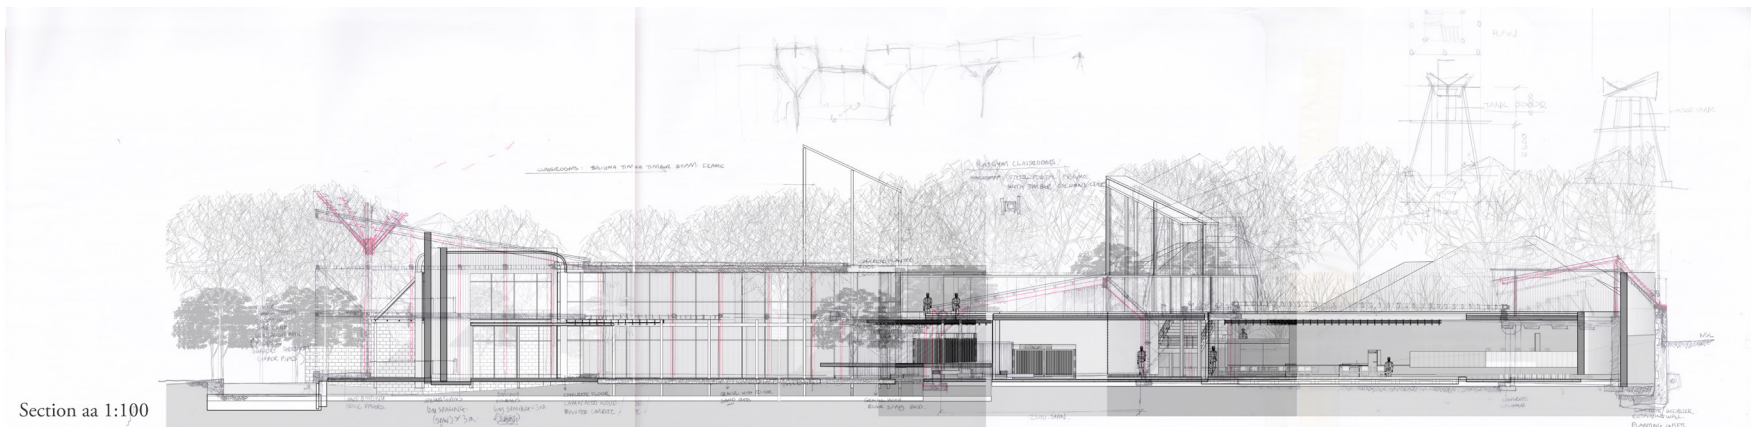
section development through classrooms, kinetic classrooms and atelier (Author, 2016)
